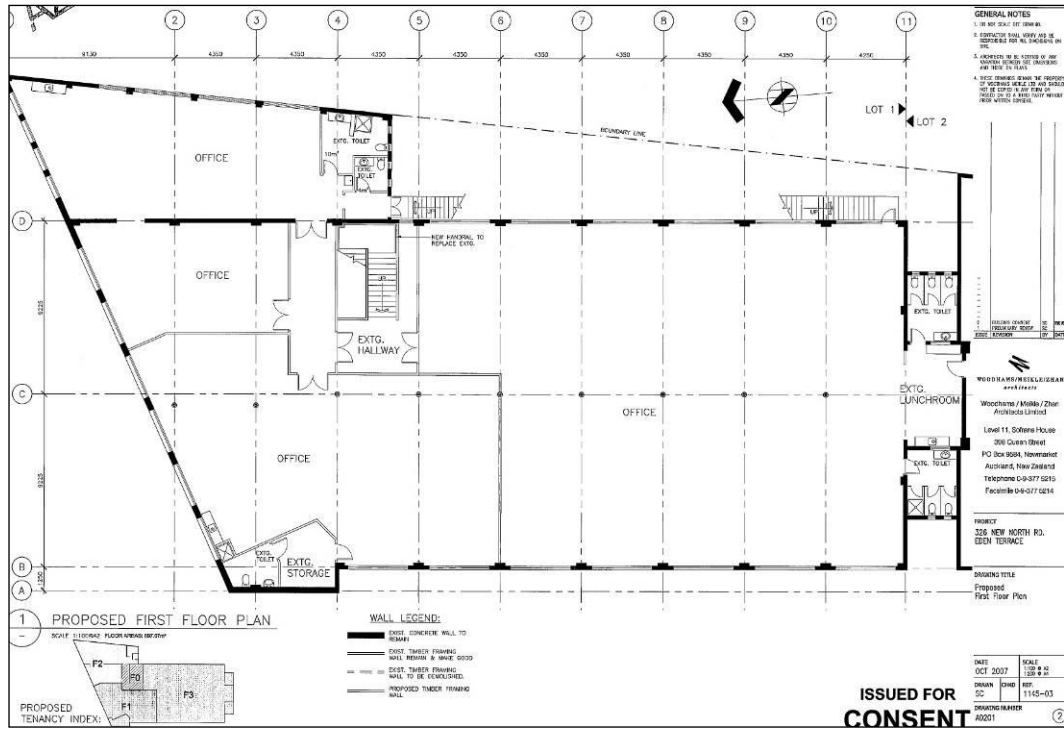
2008 Drawings for '326 New North Road Renovations & Refurbishment Building Consent' - by Woodhams/Meikle/Zhan Architects: Proposed First Floor Plan. Auckland Council Filenet. Accessed October 2016.
